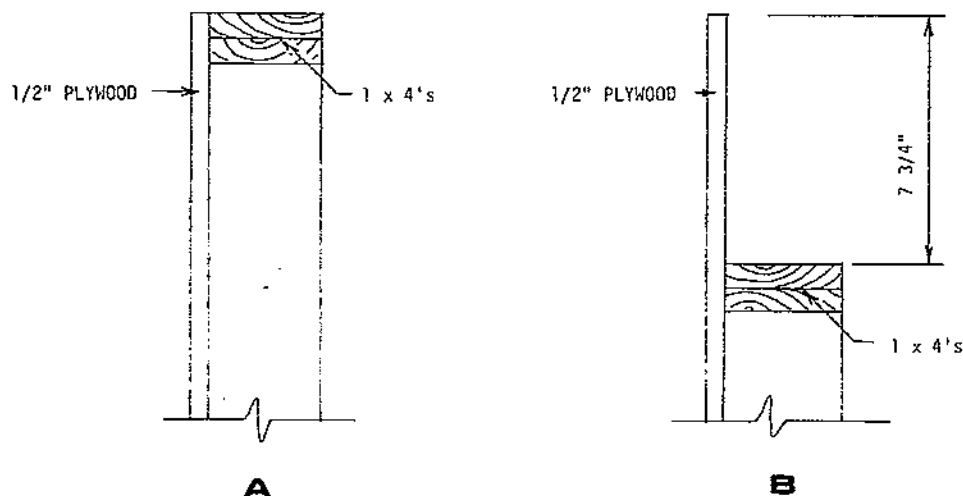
Modification of foundation panel to provide a secure tie between floor joists and panel. *A*, Original foundation panel. *B*, Foundation panel with lowered top plate.
